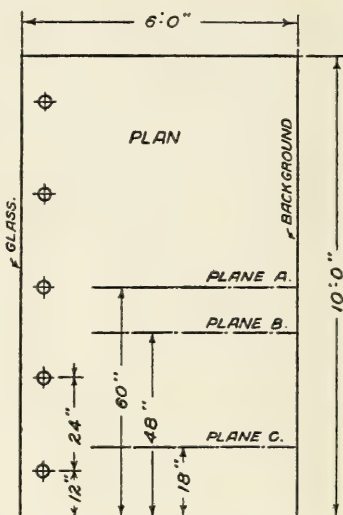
Plan of Class B window (medium trim) showing location of test planes and ceiling outlets.
